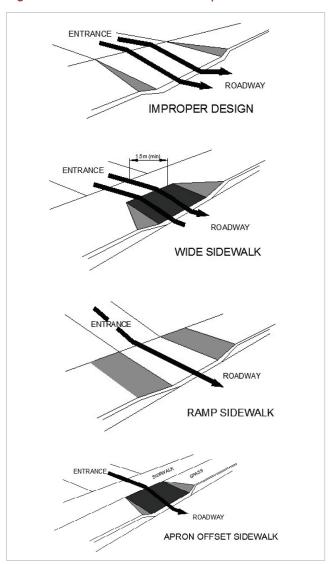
Sidewalk Cross Slope at Entrances
